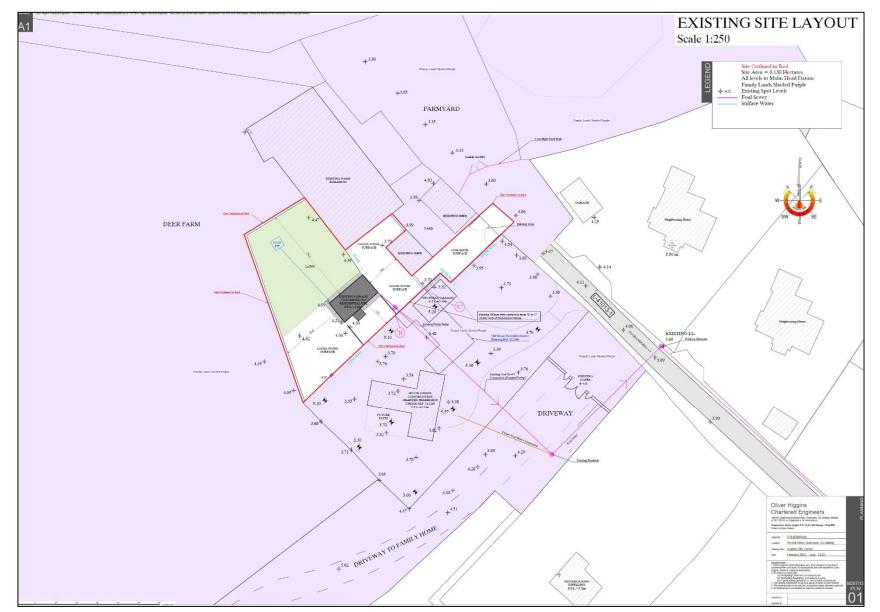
Plan of the existing Project showing connection to municipal sewer.
